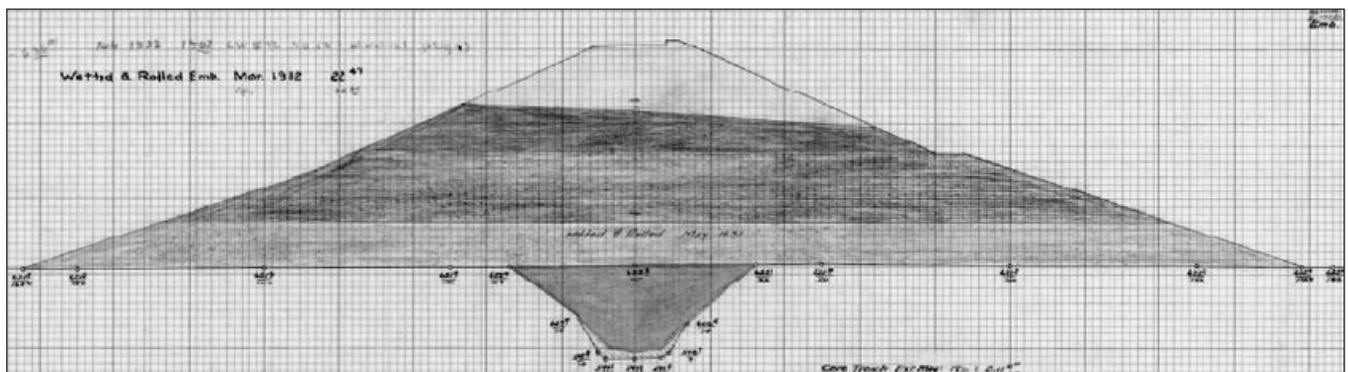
Construction Progress Cross Section of Wetted and Rolled Section (Portions of Main Dam and all of Spillway Dam)
